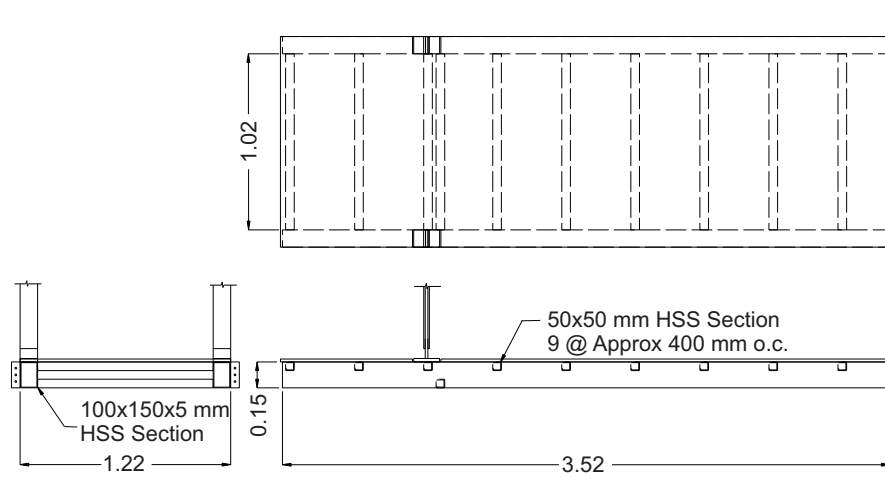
Section views of the as-built bridge superstructure in metres, before addition of force plates.
